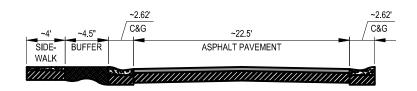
EXISTING TWO LANE AVITAL DRIVE TYPICAL SECTION
